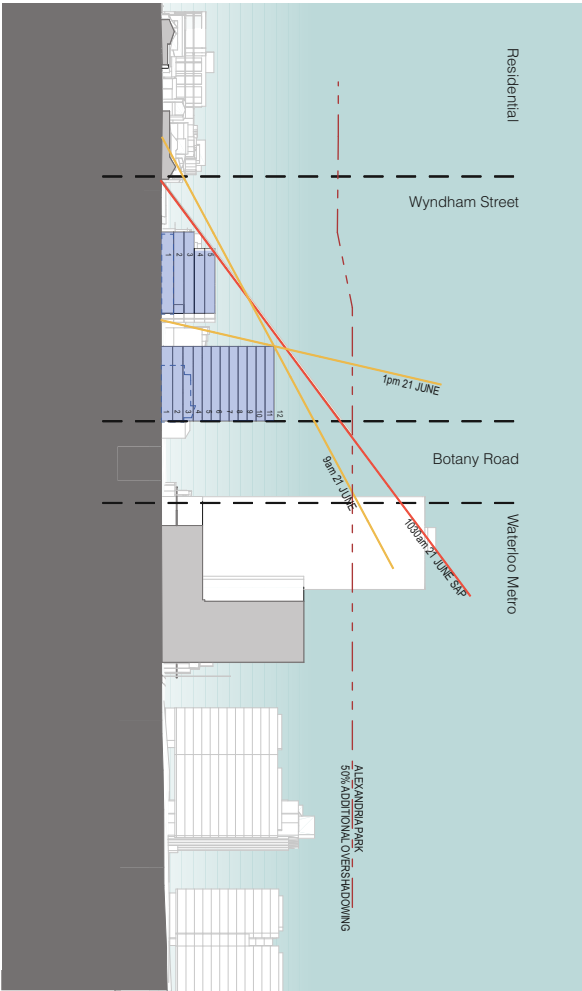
Waterloo Metro Quarter Precinct - proposed sun access plane section.
